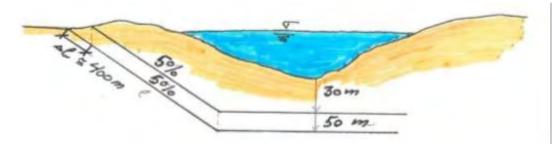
Reduced tunnel length by reduction of rock overburden from 50 m to 30 m and EU requirements of 5% inclination
